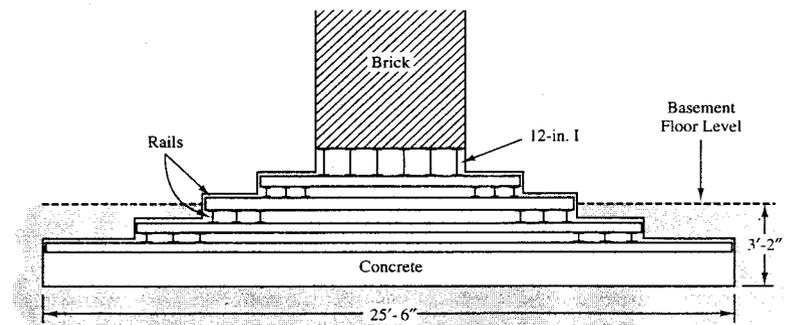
Steel grillage footing made from railroad tracks, Montauk Block Building, Chicago, 1882. The concrete that surrounded the steel was for corrosion protection only (Peck, 1948).
